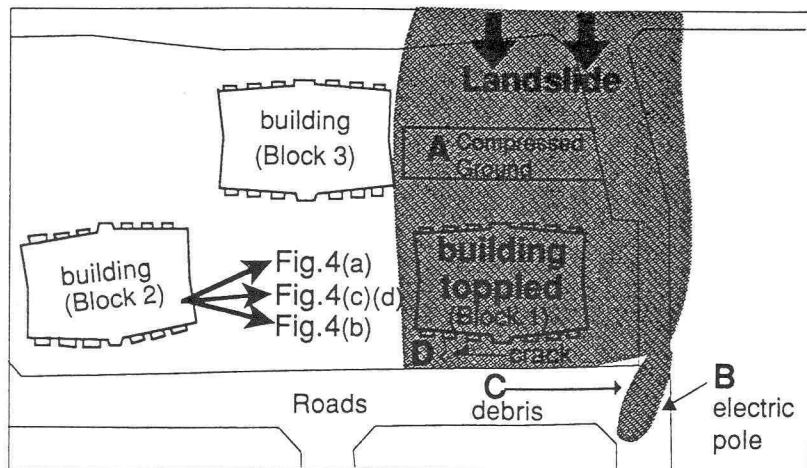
Plan of the site and the locations of ground deformations prior to building collapse.
